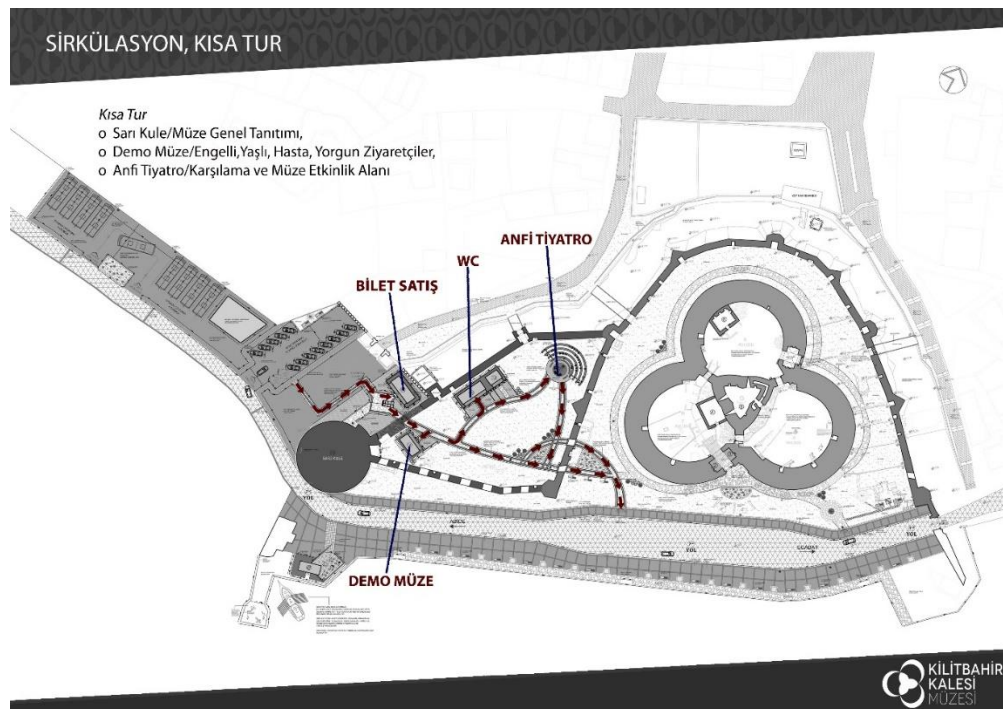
Kilitbahir Castle Site Plan-Short Tour Route, K. Duyar.
